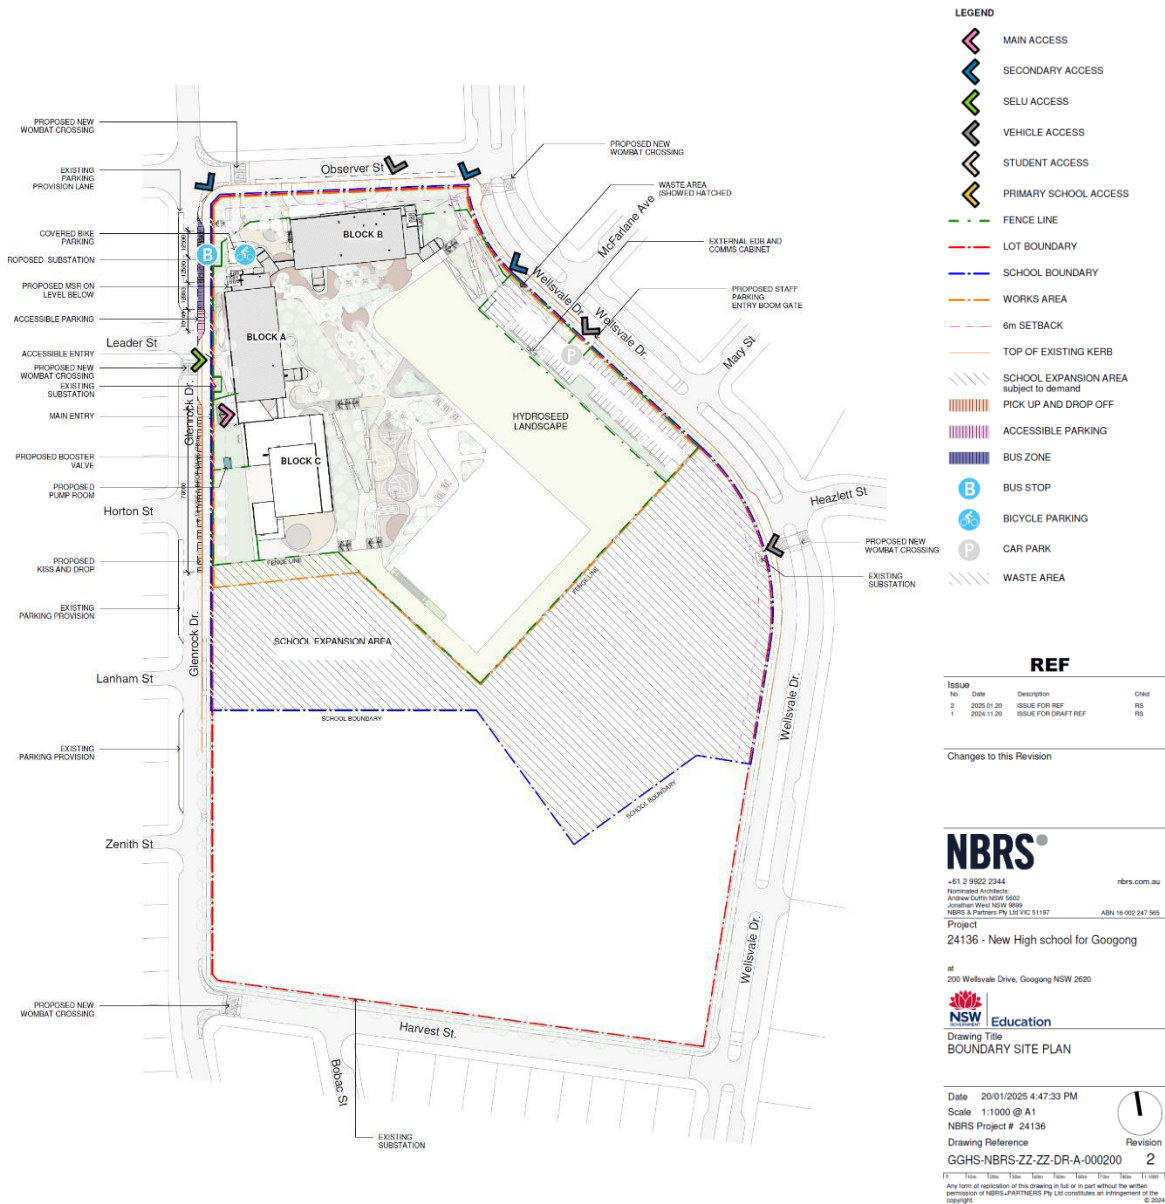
Proposed Site Plan (Source: NBR'S & Partners, 20/01/2025)
